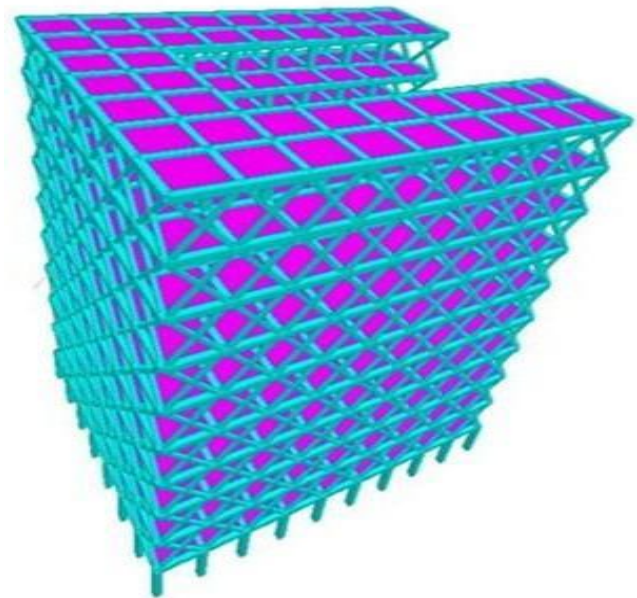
3D Rendering view of C Base plan structures in STAAD Software
